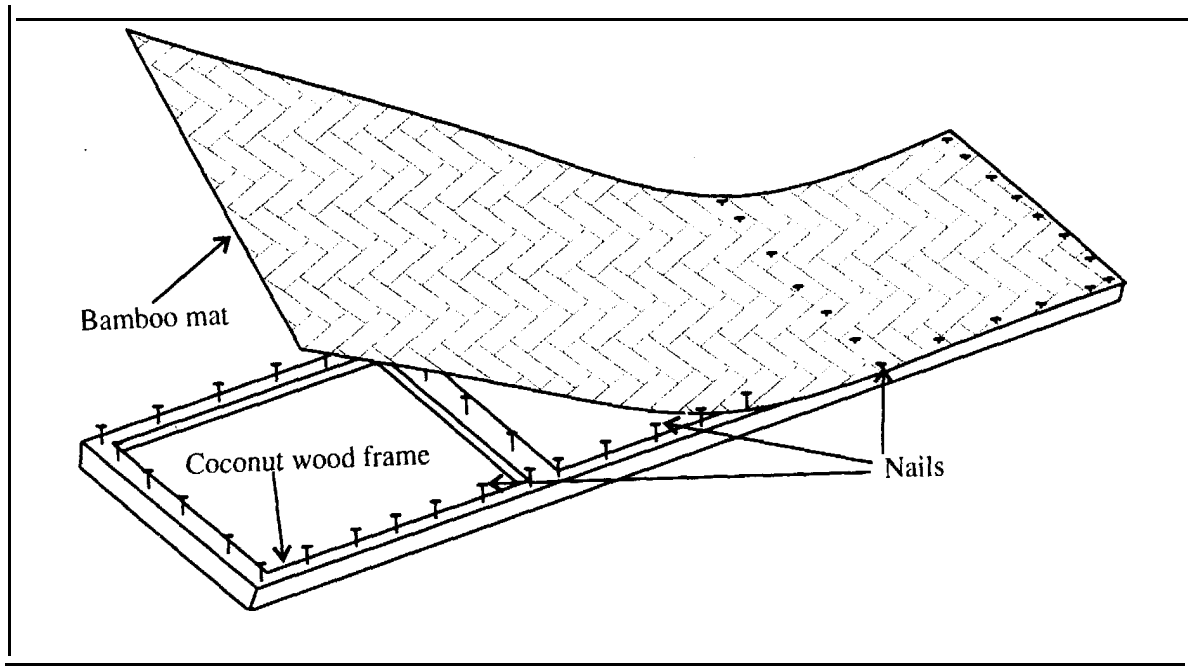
Coconut wood frame with diagonal bamboo mat reinforcement
